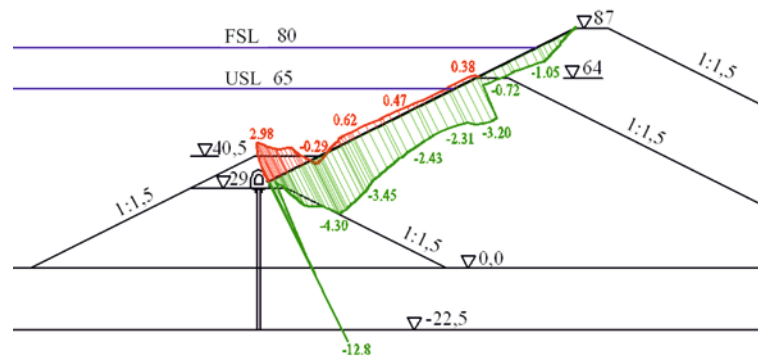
Stresses (MPa) on the downstream face of the reinforced concrete face in the direction along the face
